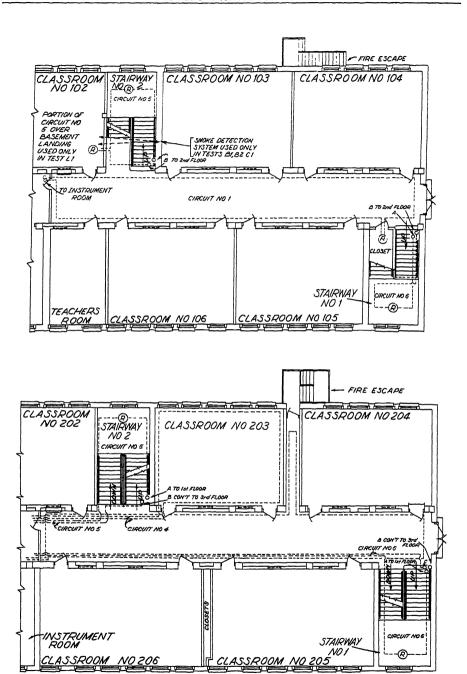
Floor plans of first (upper drawing) and second floors showing location of pneumatic tubing of rate-of-rise automatic fire detection system.
